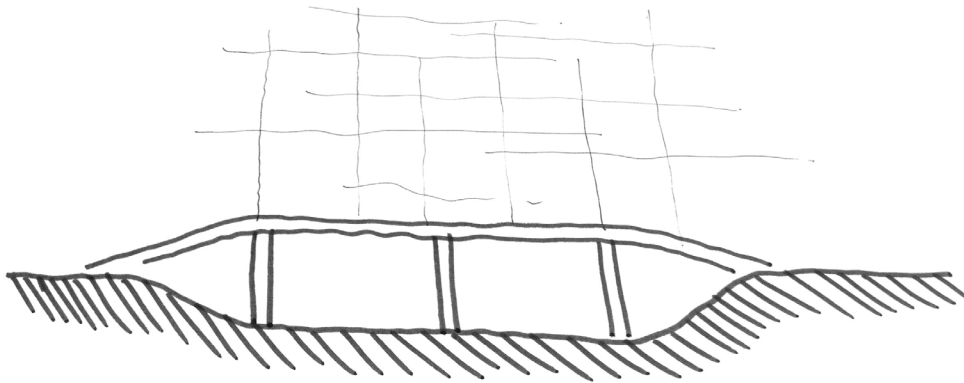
Lightweight steel structure grounded on concrete public surface.
